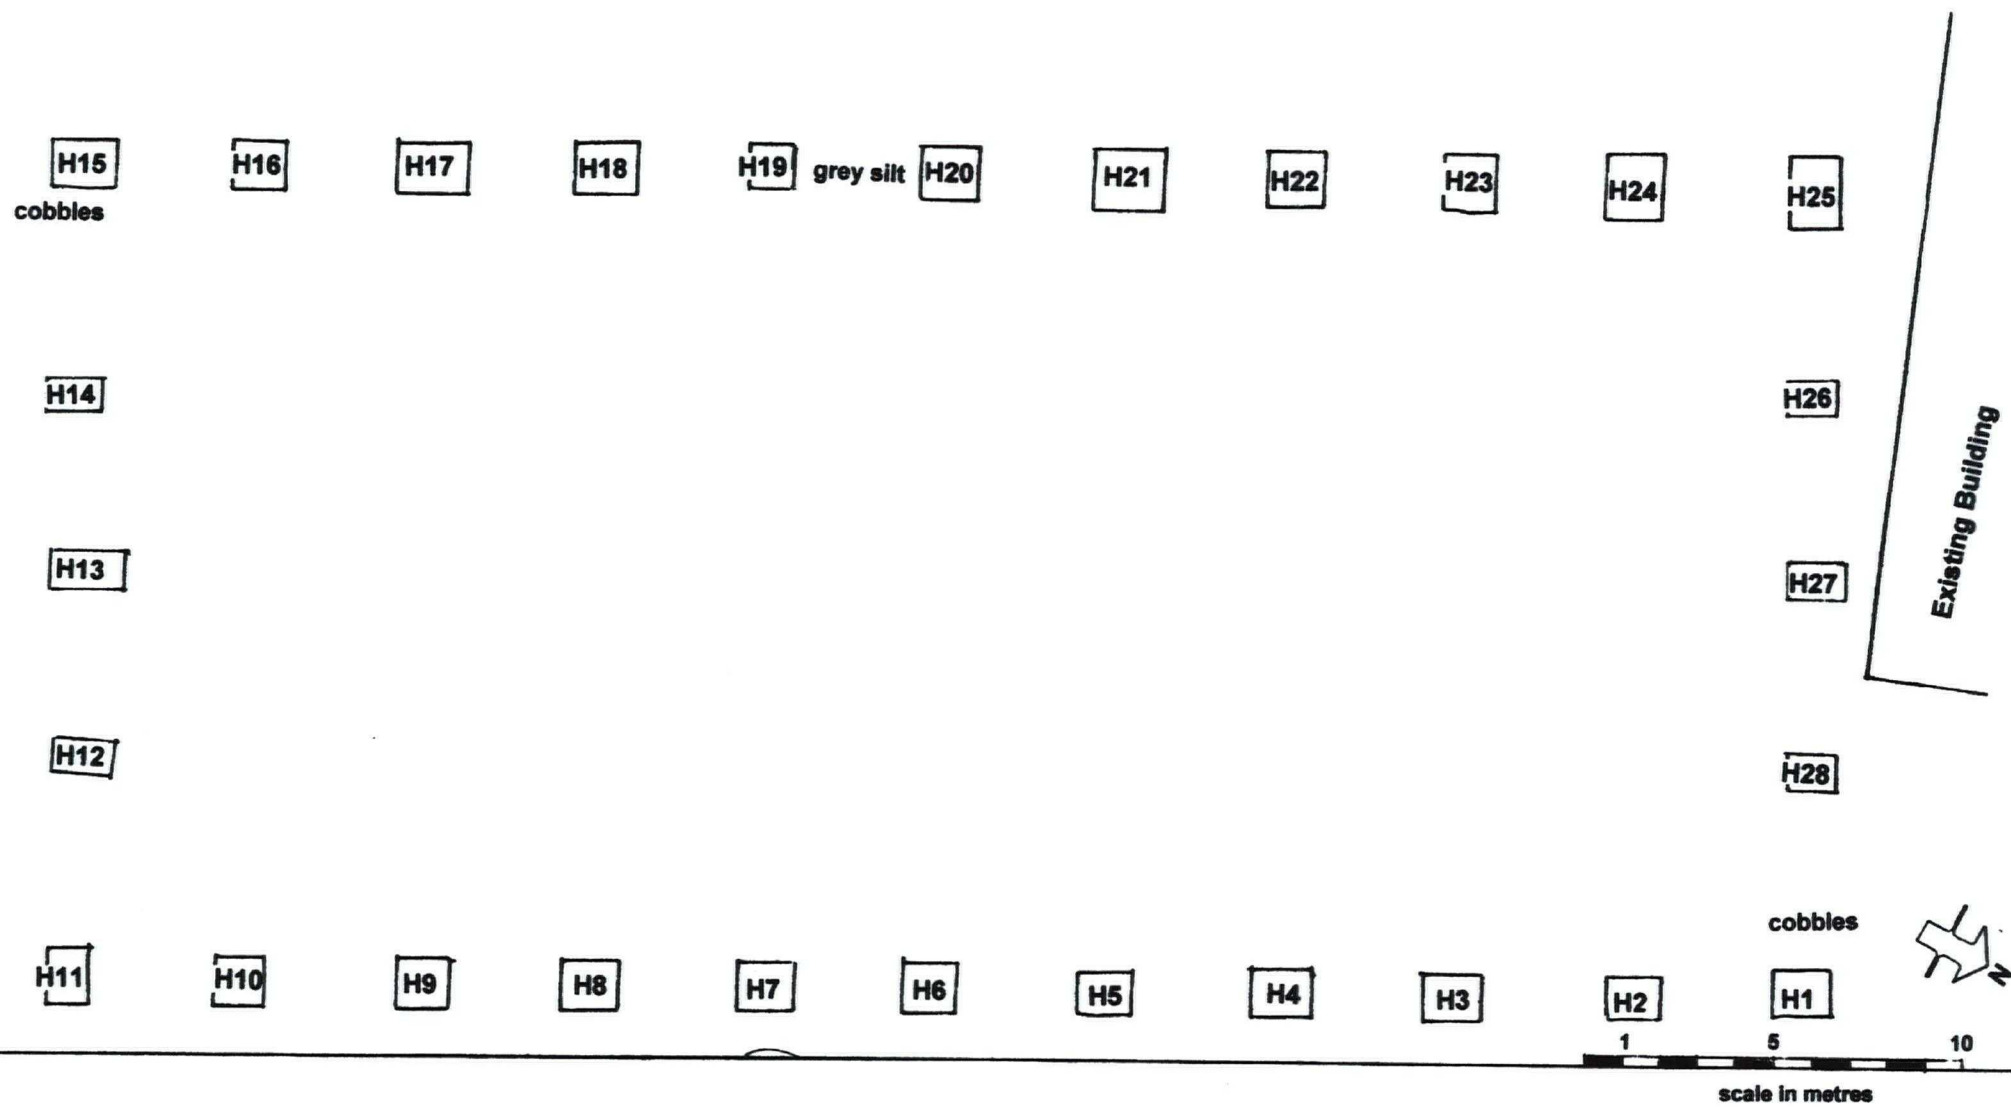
Old Hall Farm, Thornton-le-Street – Column Supports
